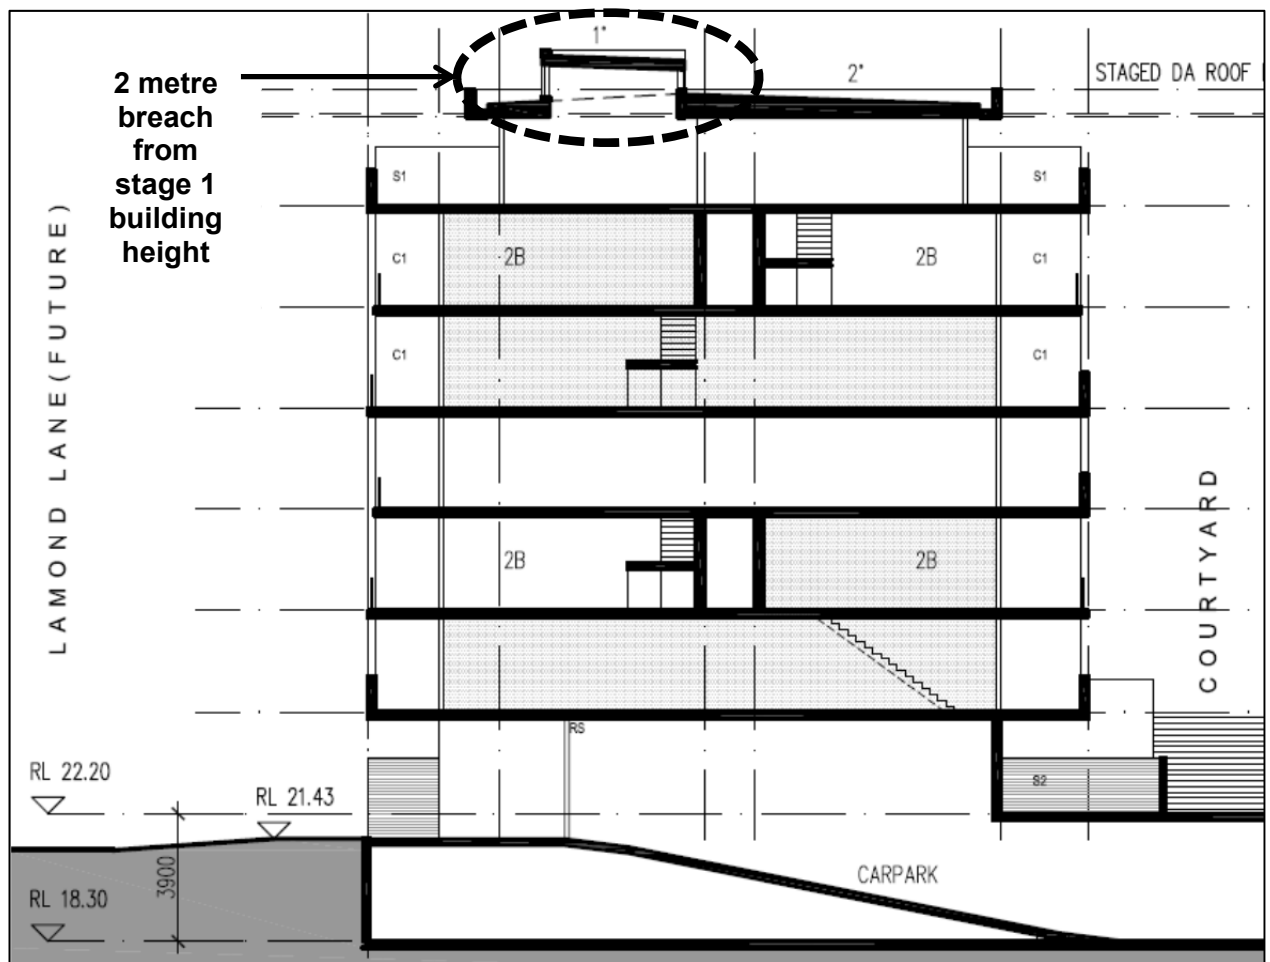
Clerestory window elements of Building A2 in breach of the approved Stage 1 building height
